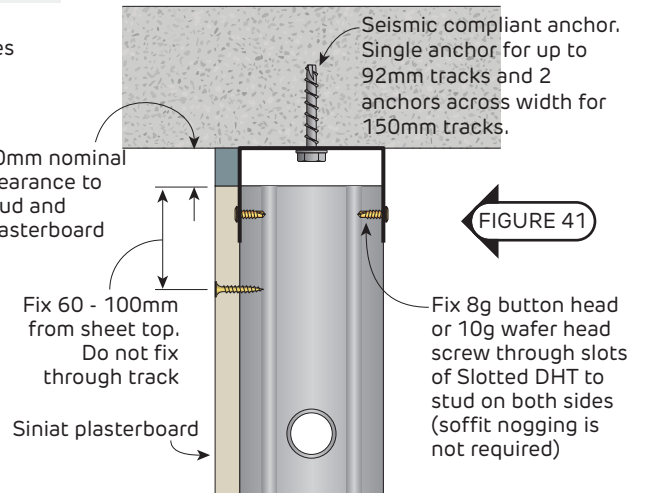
Wall Head - Lined One Side Only Slotted Deflection Head Track Section
